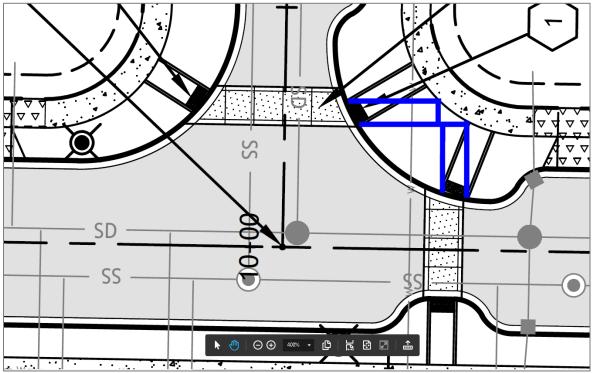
Exhibit S Conceptual Alignment of ADA transitions and landing area / sidewalk
